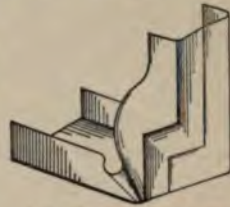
Sketch of Gutter with "Bellied" Bottom, turned up for Bossing a Break.
